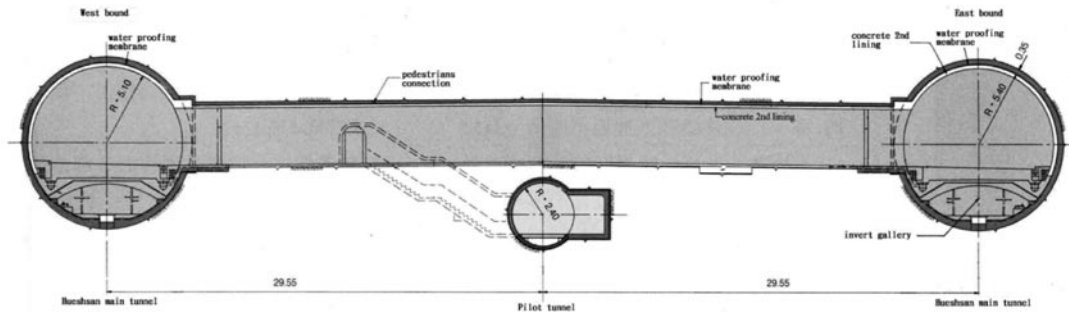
Relevant section drawing of Hueshshan Tunnel.
